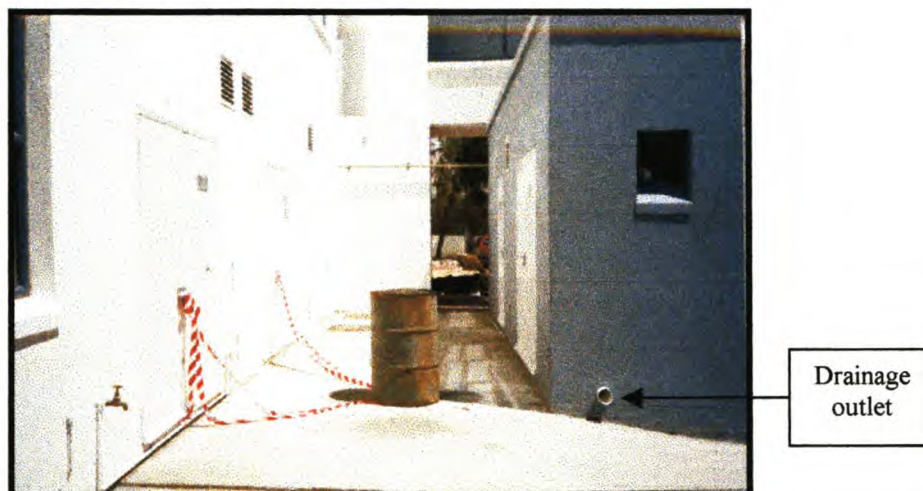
The uncontained drainage system for the waste storage area outside the JC Smuts Building
